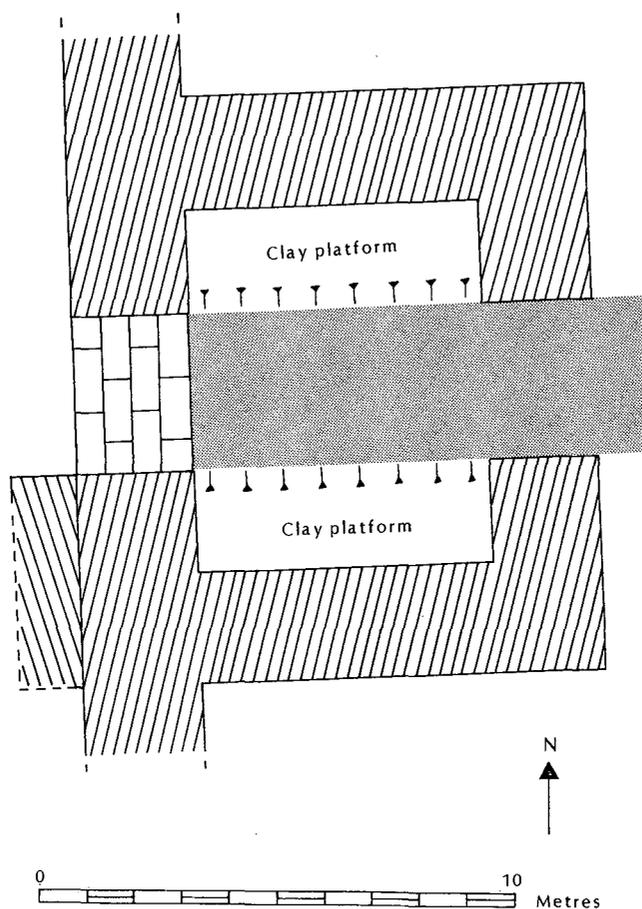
Area S. Reconstruction plan of the gate and adjacent section of curtain-wall.
